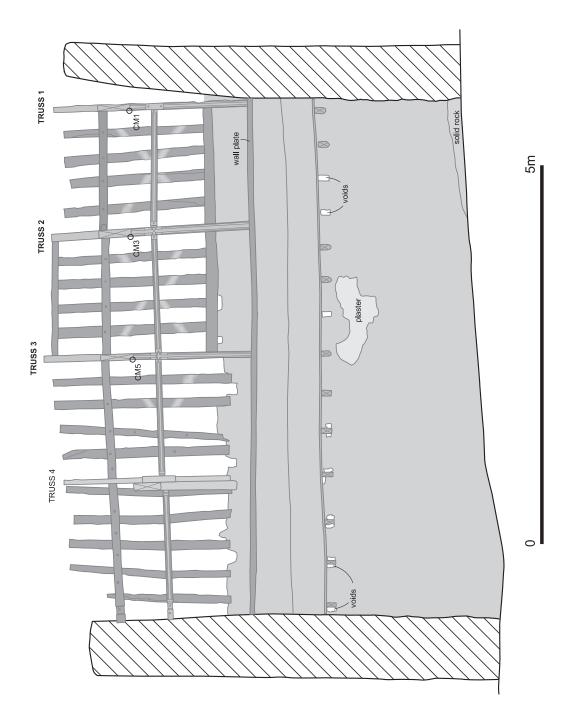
The chapel at Lower Alsworthy, interior elevation of north wall (scale 1:50 @A4). Carpenter's Marks (CMn) as shown in Fig.11; original truss blades in bold. Surviving 15<sup>th</sup> century roof timbers depicted in a darker tone.
